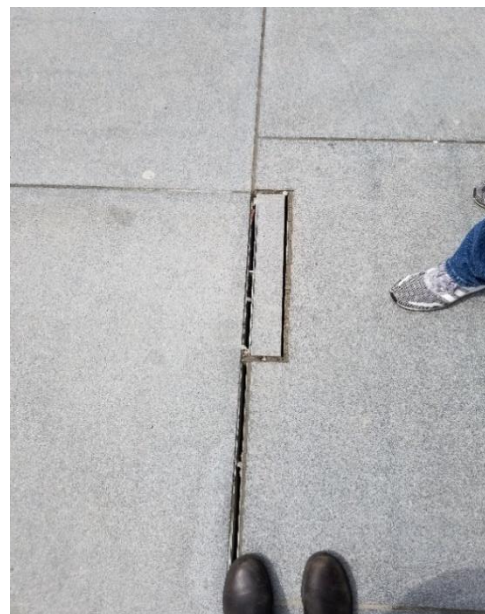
8 Eglinton Avenue East POPS- April 22 Showing uneven surface tiles
